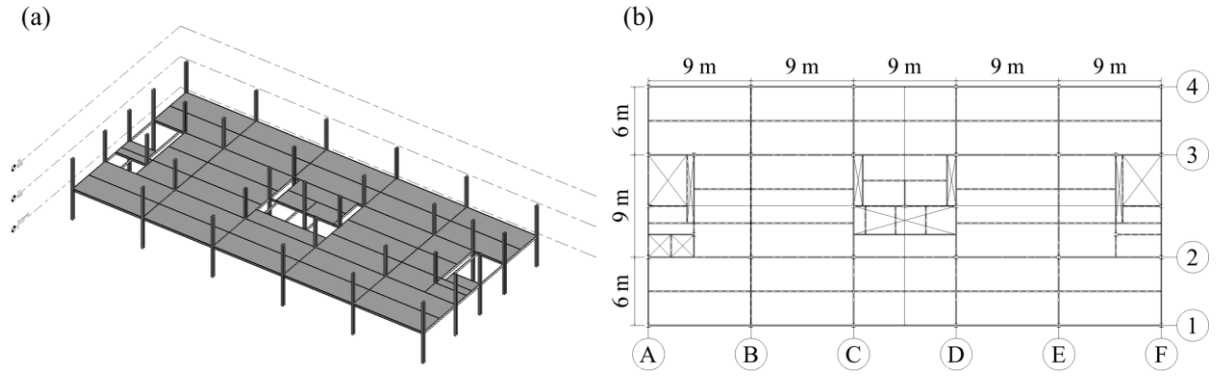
Revit model for the Cardington building (a) 3D view, and (b) plan view
